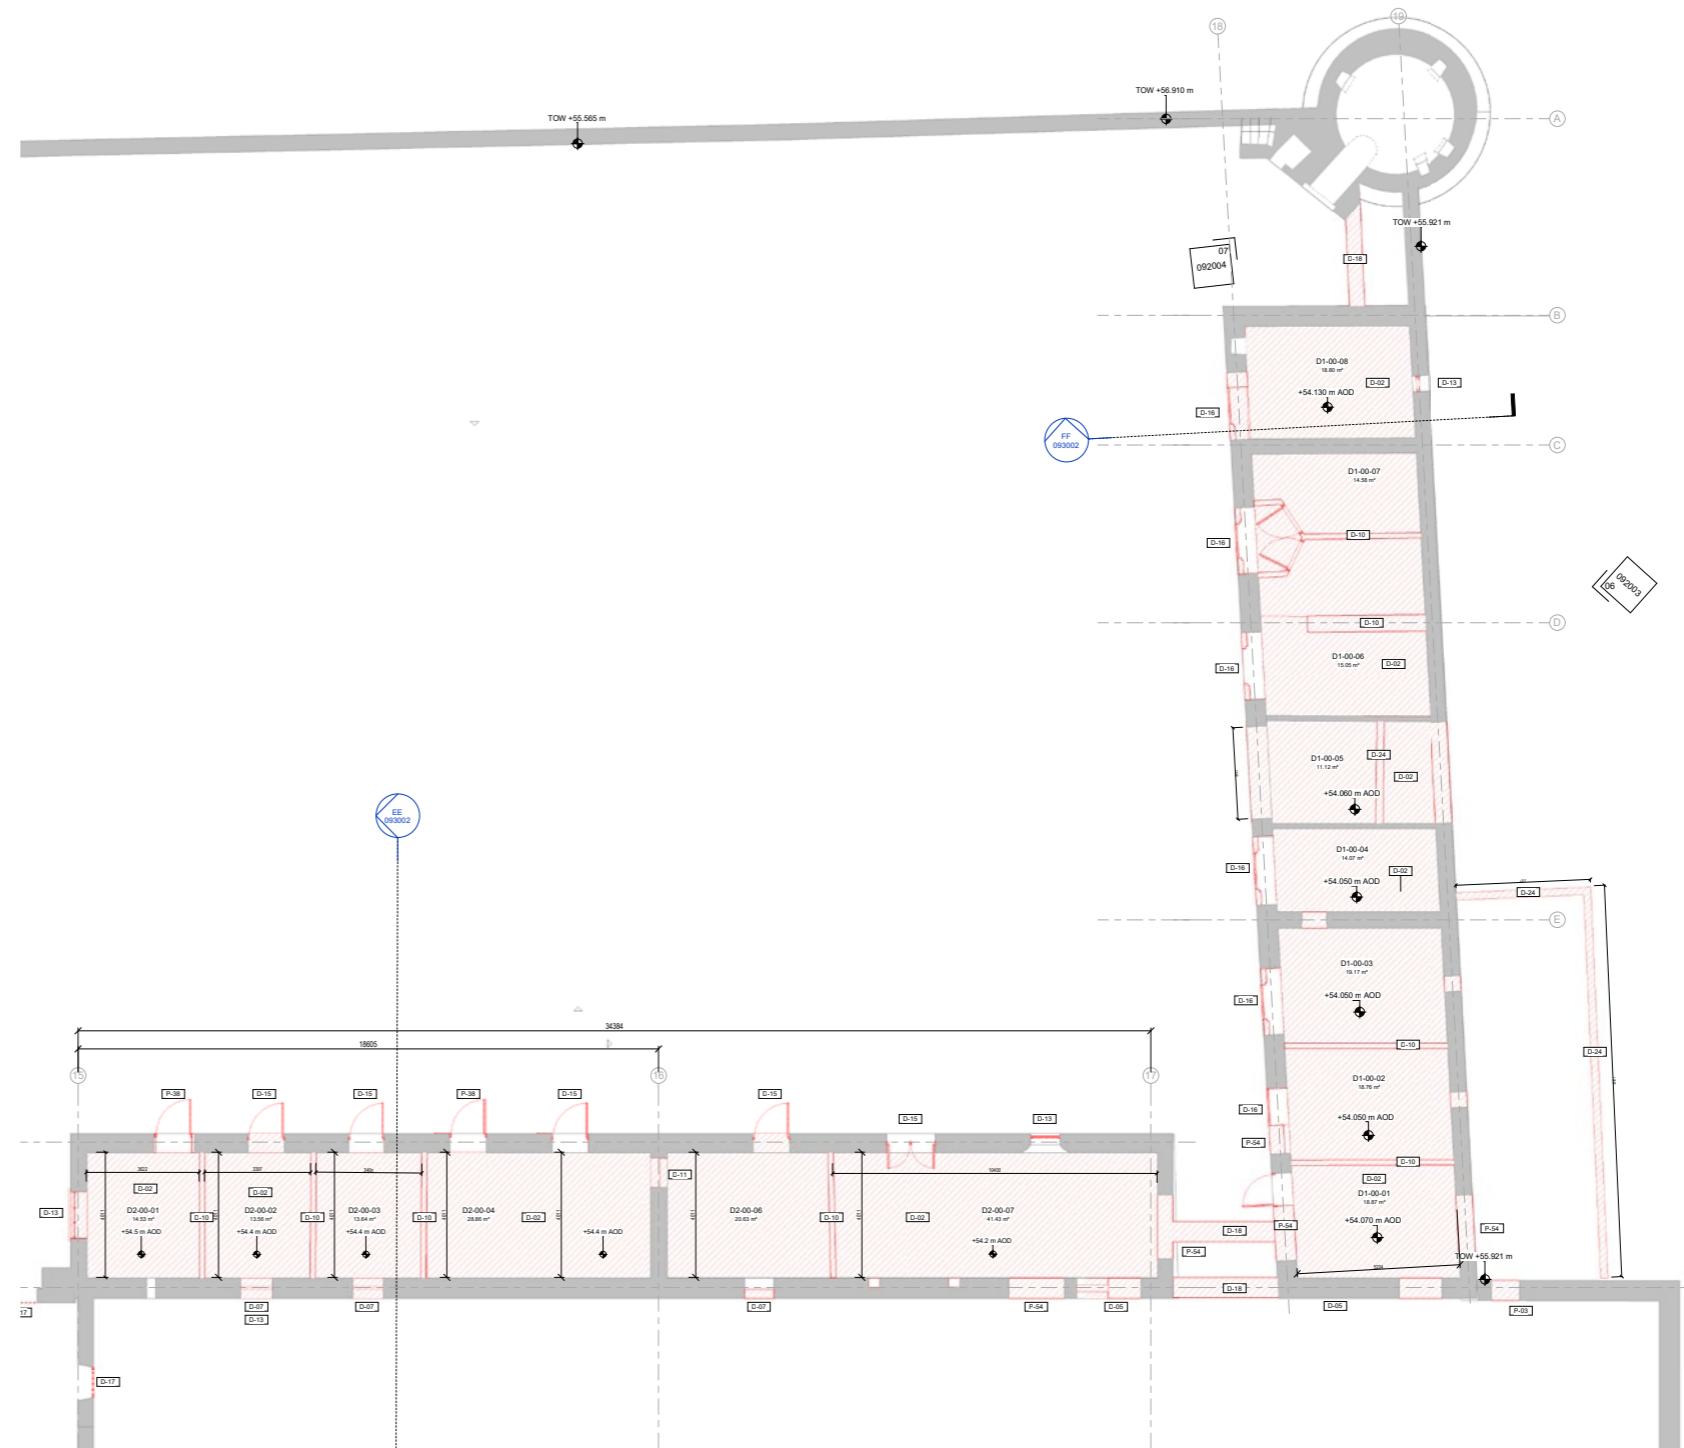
; Existing Ground and First Floor Plan. Removals in Red
